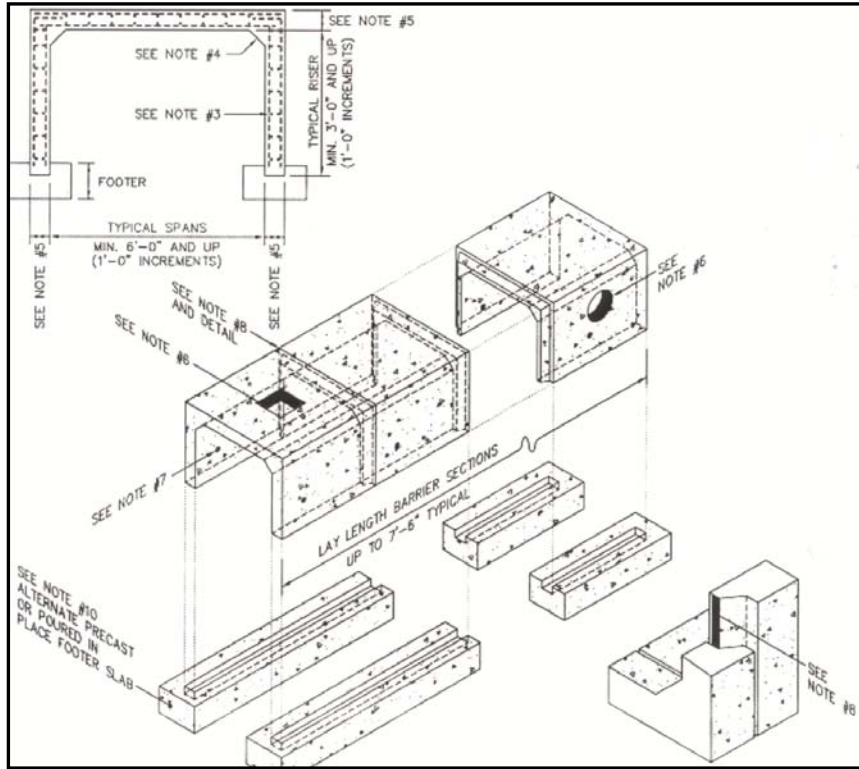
Three-sided Culvert with Footer Slabs and a Flat Top
